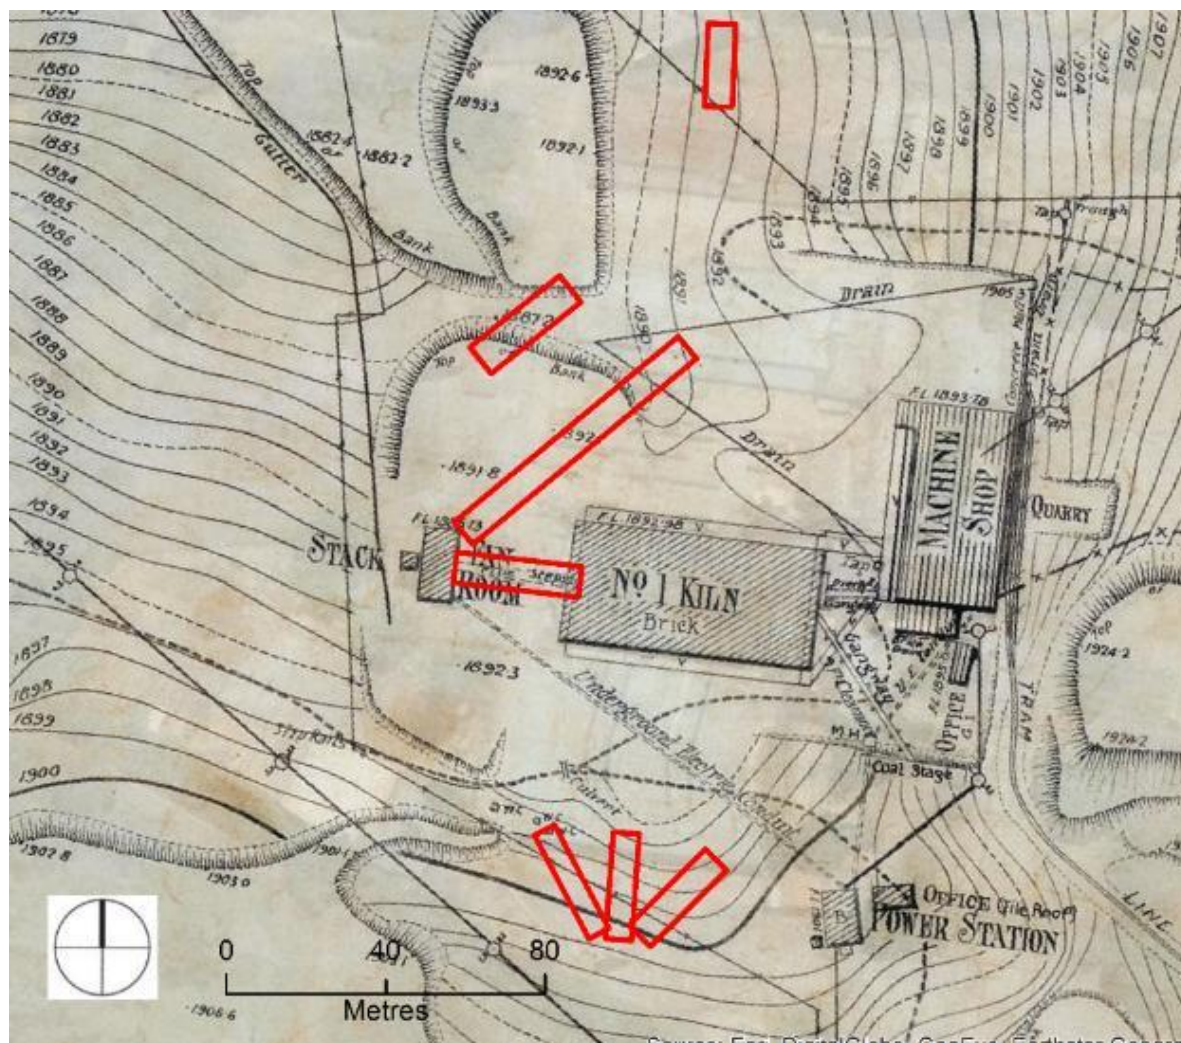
A 1916 site plan showing the location of BRW12. (Source: NAA: A6664, L165A, 1916)
